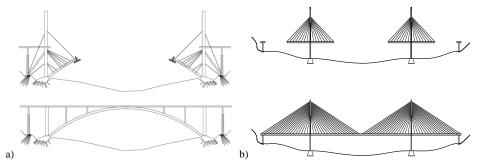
Cantilever construction of cable structures: a) arch bridge, b) cable-stayed bridge
